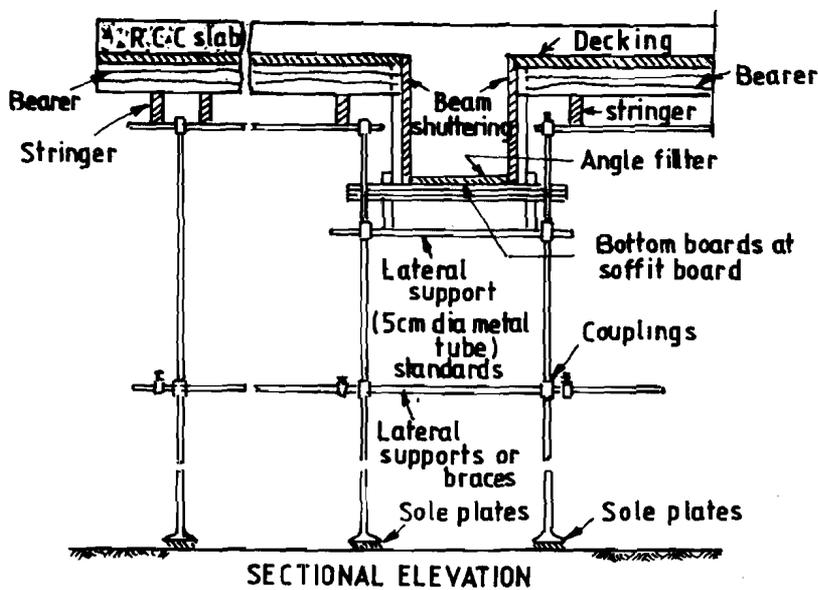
Details of Tabular Steel Scaffolding Used as Centering for Slab and Beam Construction
